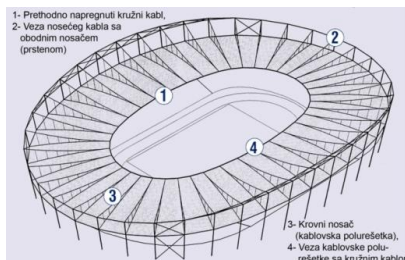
Structural plan of the suspended pre-tensioned roof
